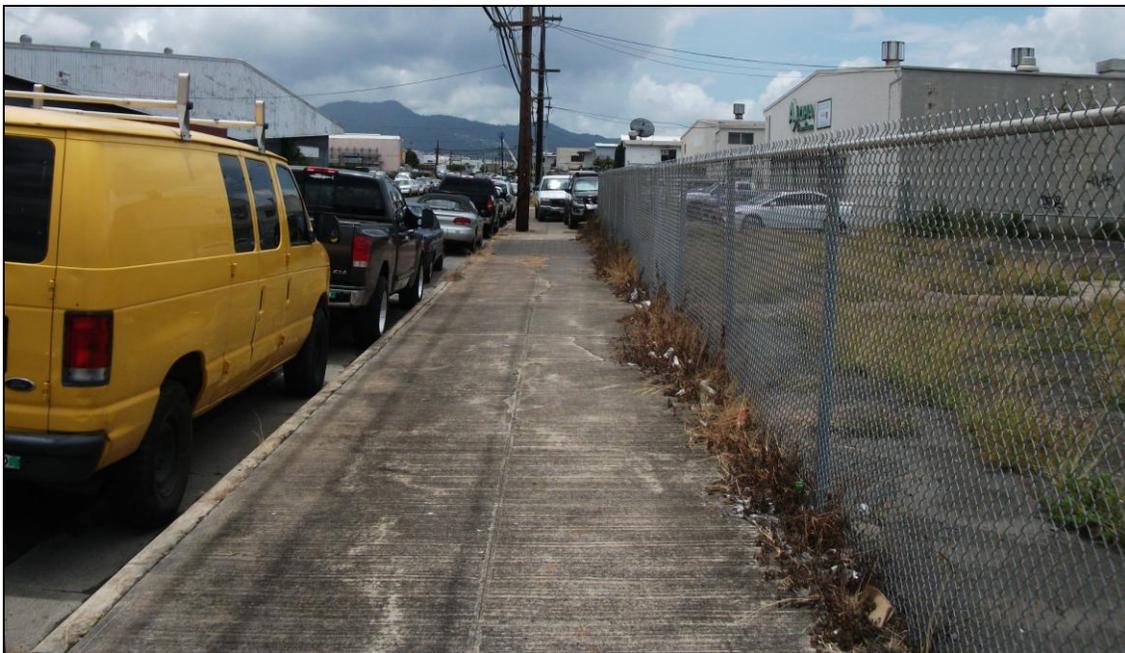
General view of proposed excavation at a column foundation at 1194+50 where corridor crosses *mauka* to Ualena Street, view to southeast
